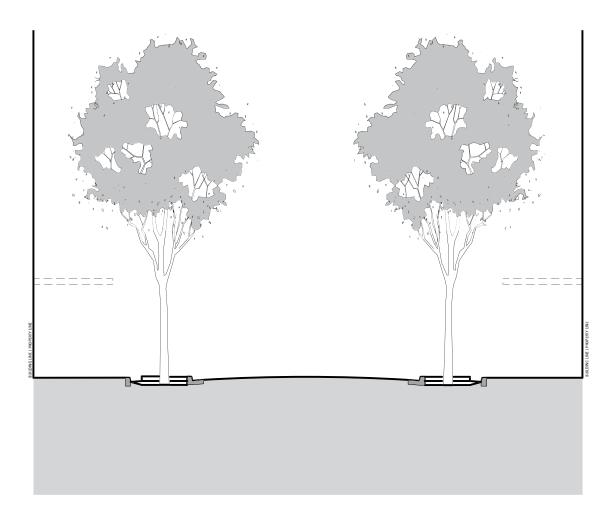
Street Tree Typical WSUD Pit Location in Footpath > 4000
